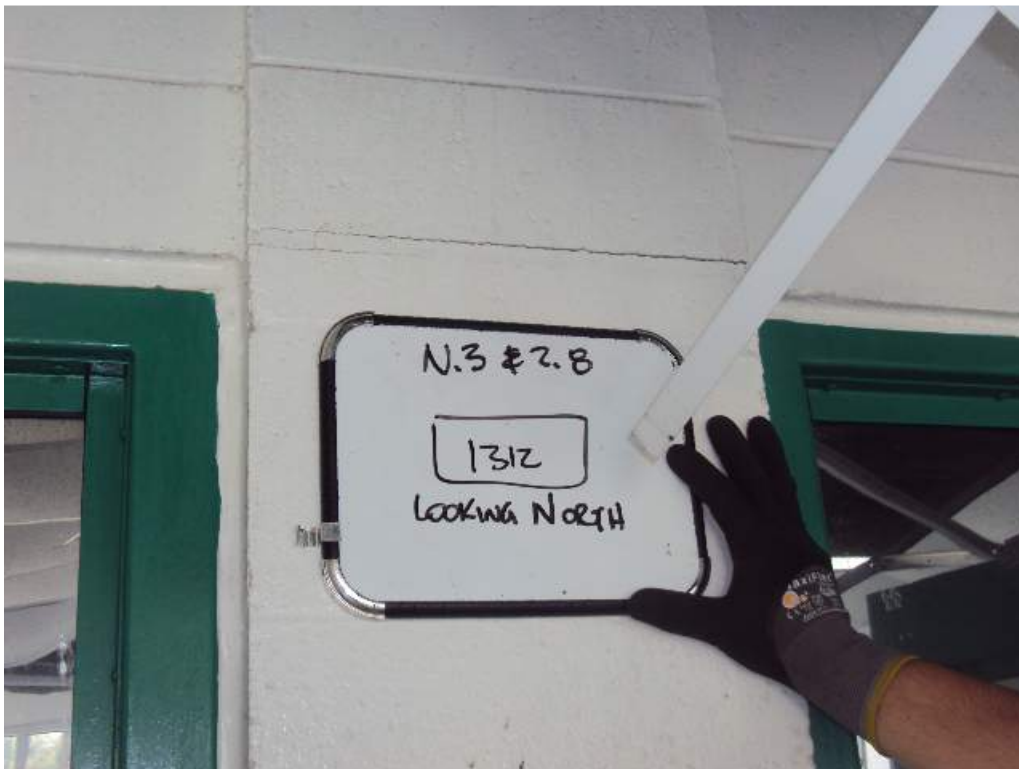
1st Floor – Room 1312– Col lines N.3 and 2.8 – Looking North – Horizontal crack in CMU column and wall
